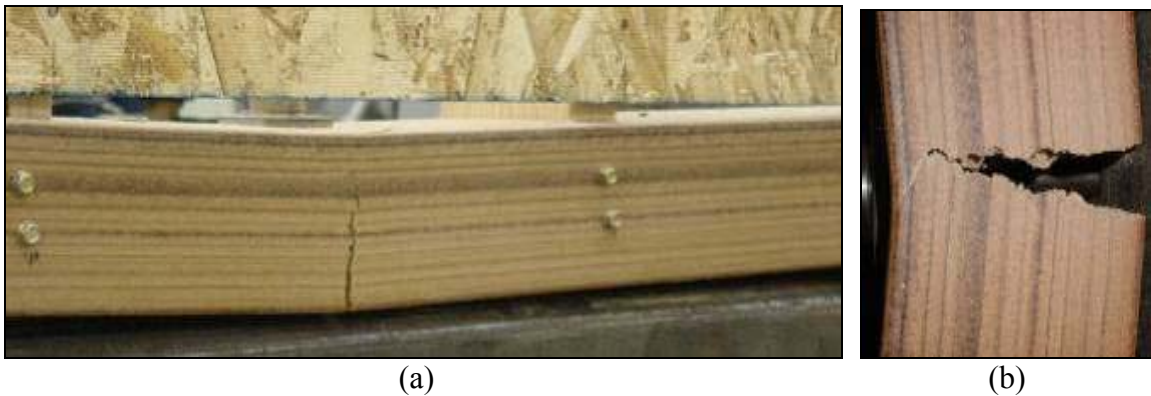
Flexural failure at second anchor bolt: (a) Location along sill, (b) Failure exposes anchor bolt within
